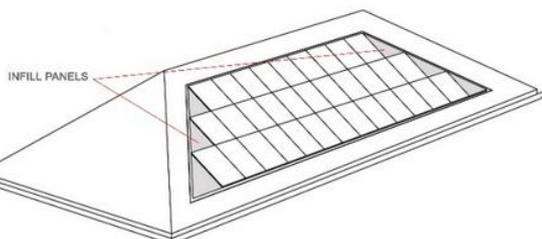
Example of a Trapezoidal Solar Array on a Trapezoidal Roof Plane.
